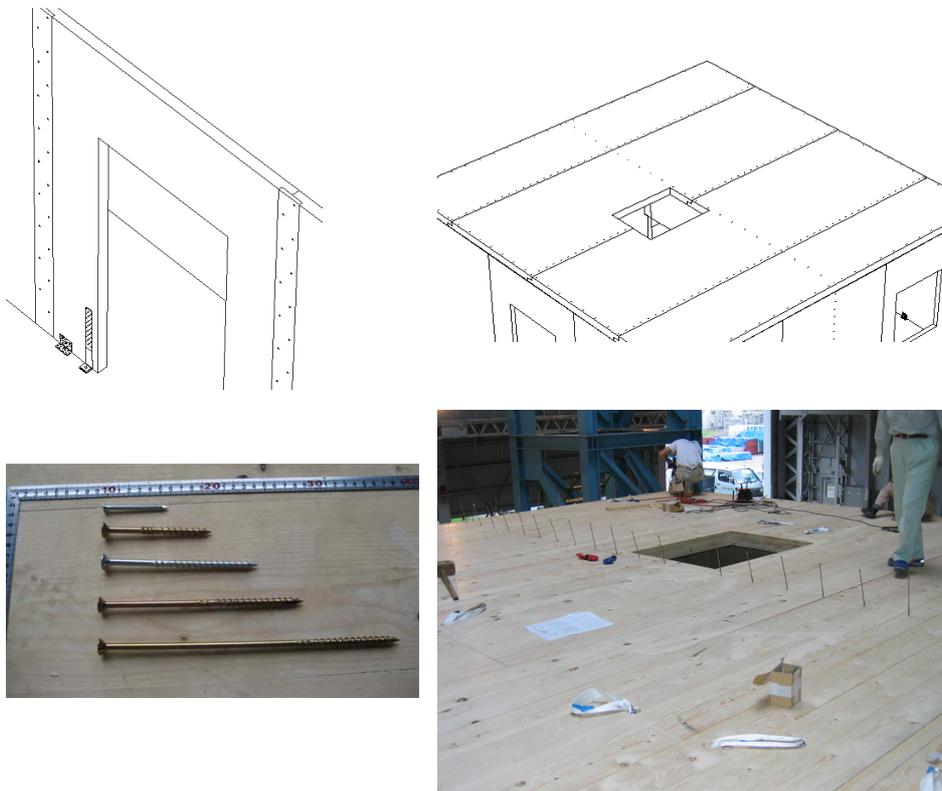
Vertical joint between wall panels and horizontal joint between floor panels and self-drilling screws used to connect panels.
